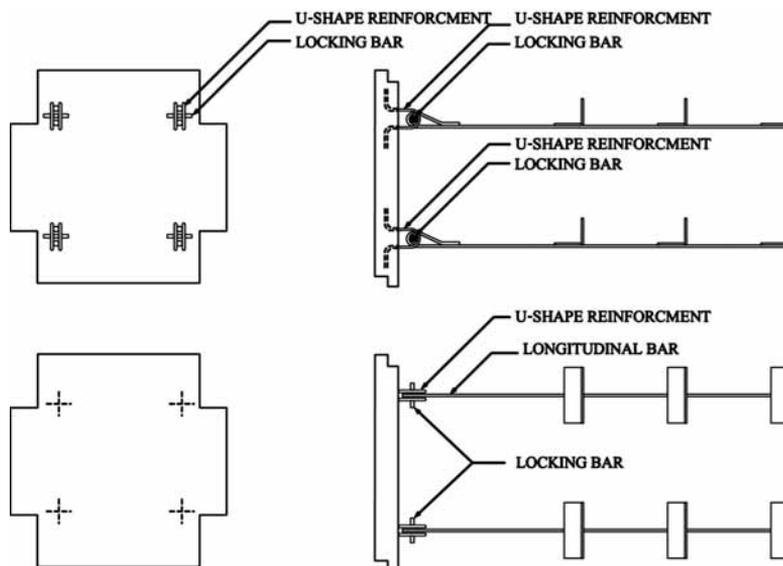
Connection of the bearing reinforcement to wall facing (Horpibulsuk and Niramitkornburee, 2010)
